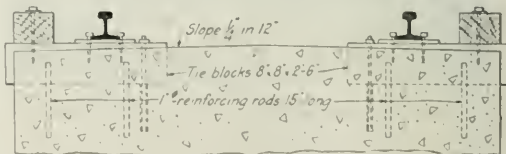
Track Construction in the Bergen-Hill Tunnel
